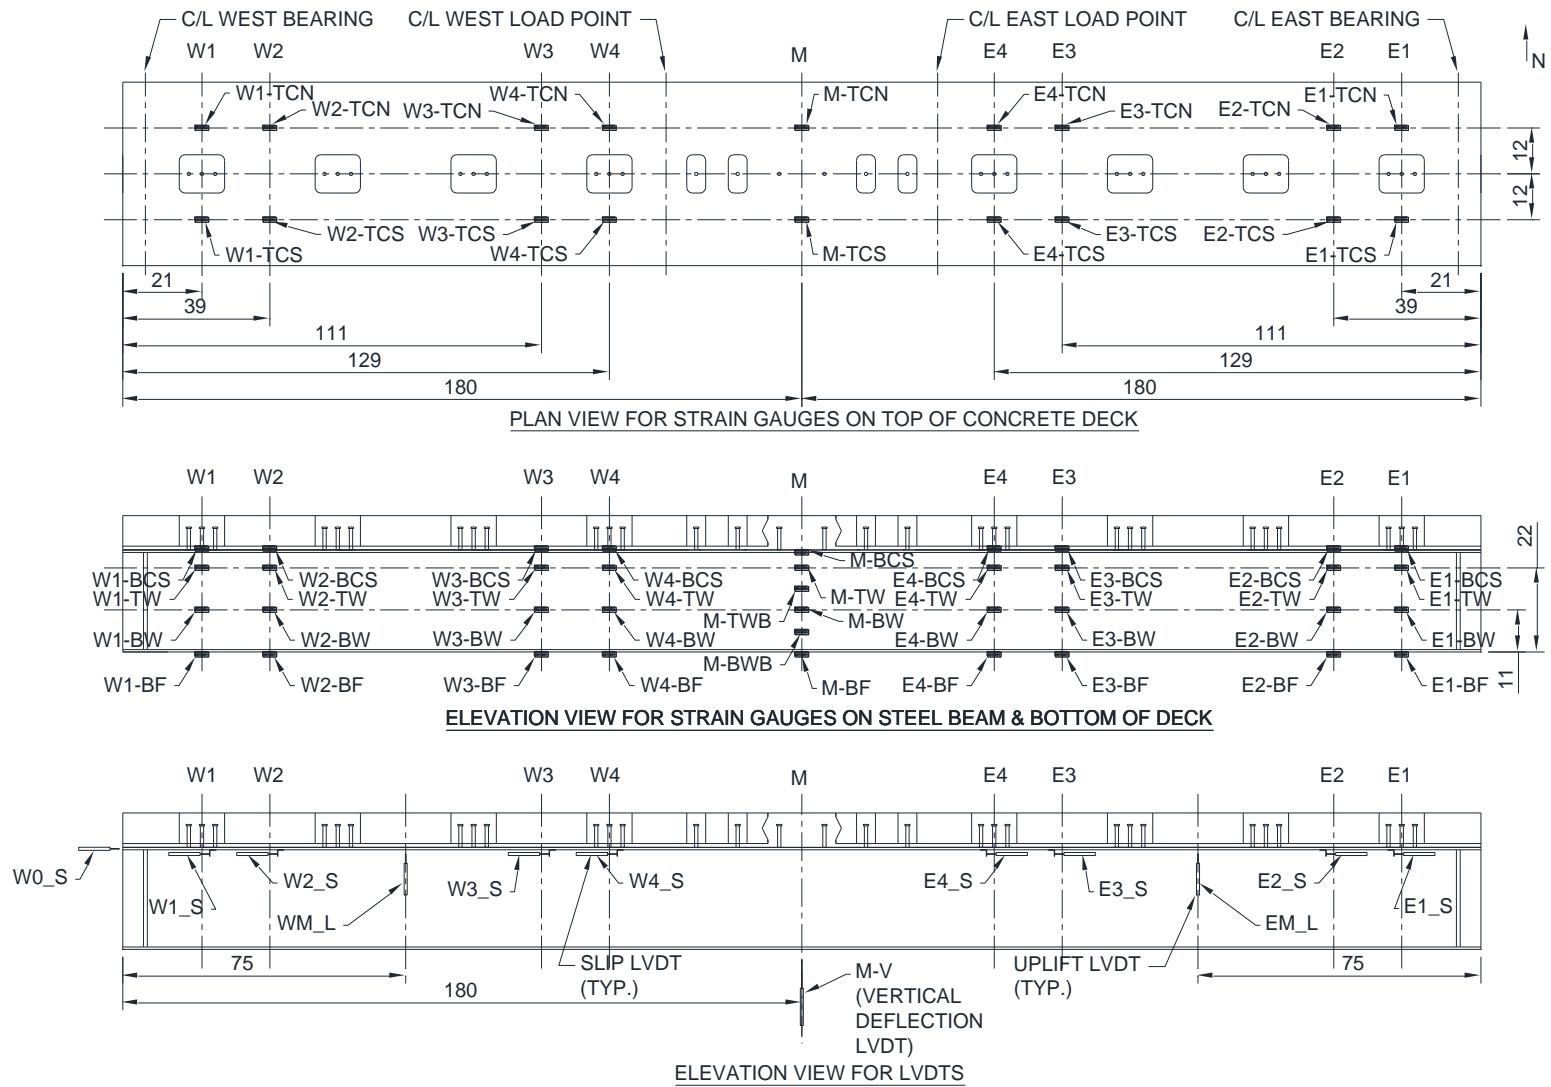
Schematic. Plan and elevation views for instrumentation on a large-scale specimen with 12-inch shear stud spacing.
